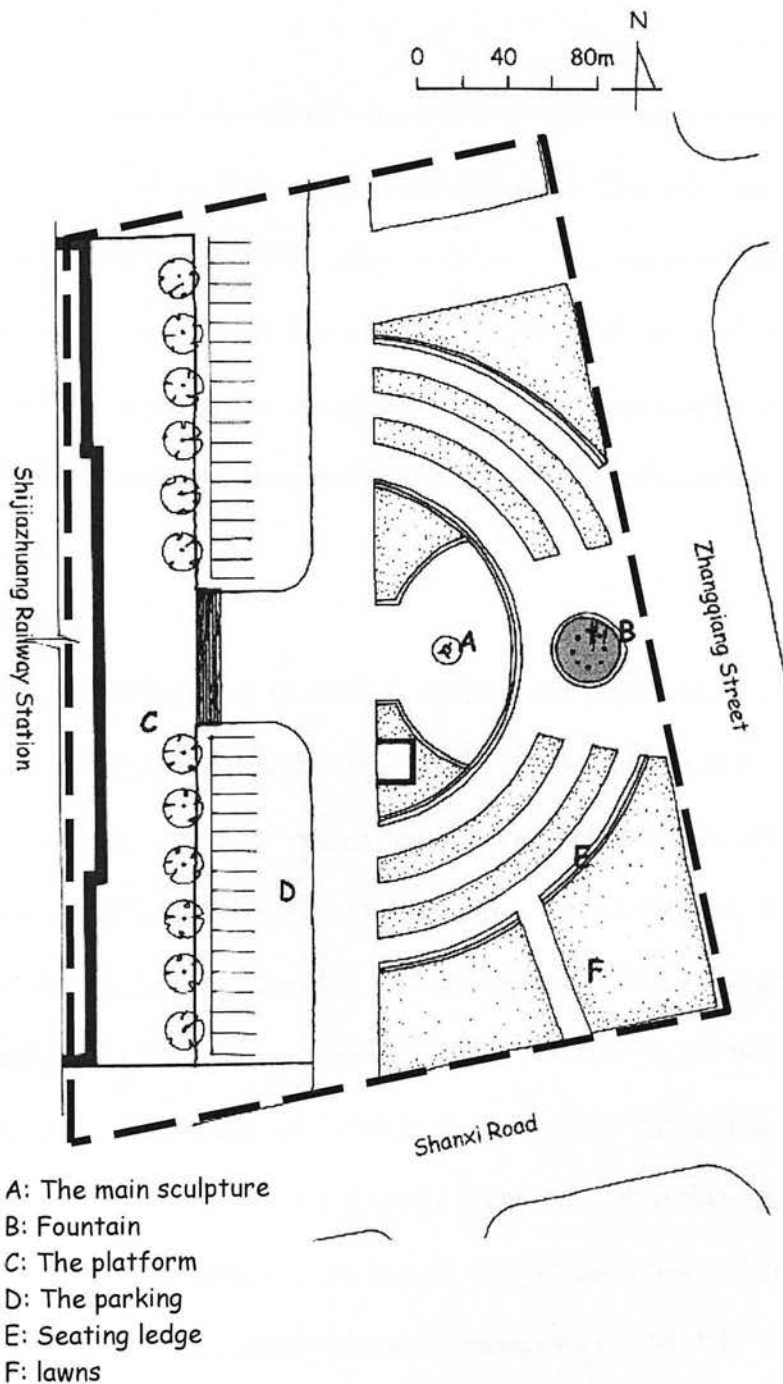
Site plan of the Railway Station Square, Shijiazhuang
